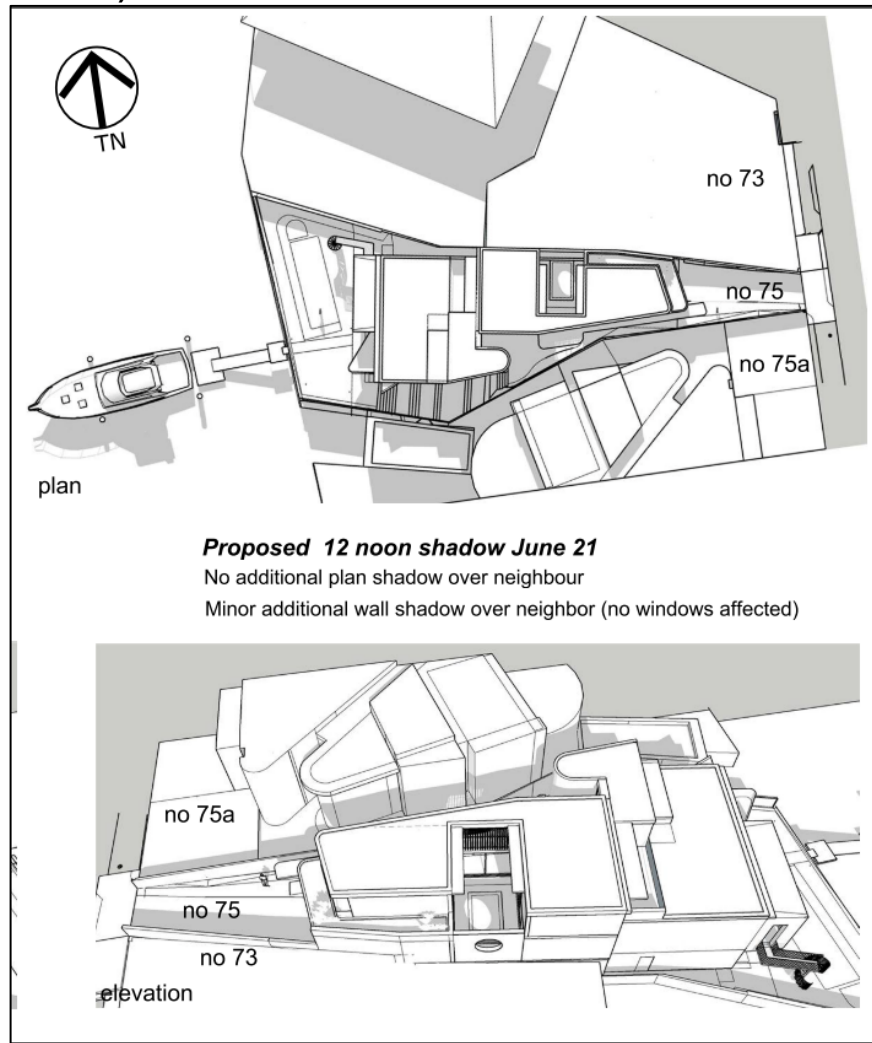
Proposed shadow cast at 12pm onto neighbouring property at 75A Wharf Road
